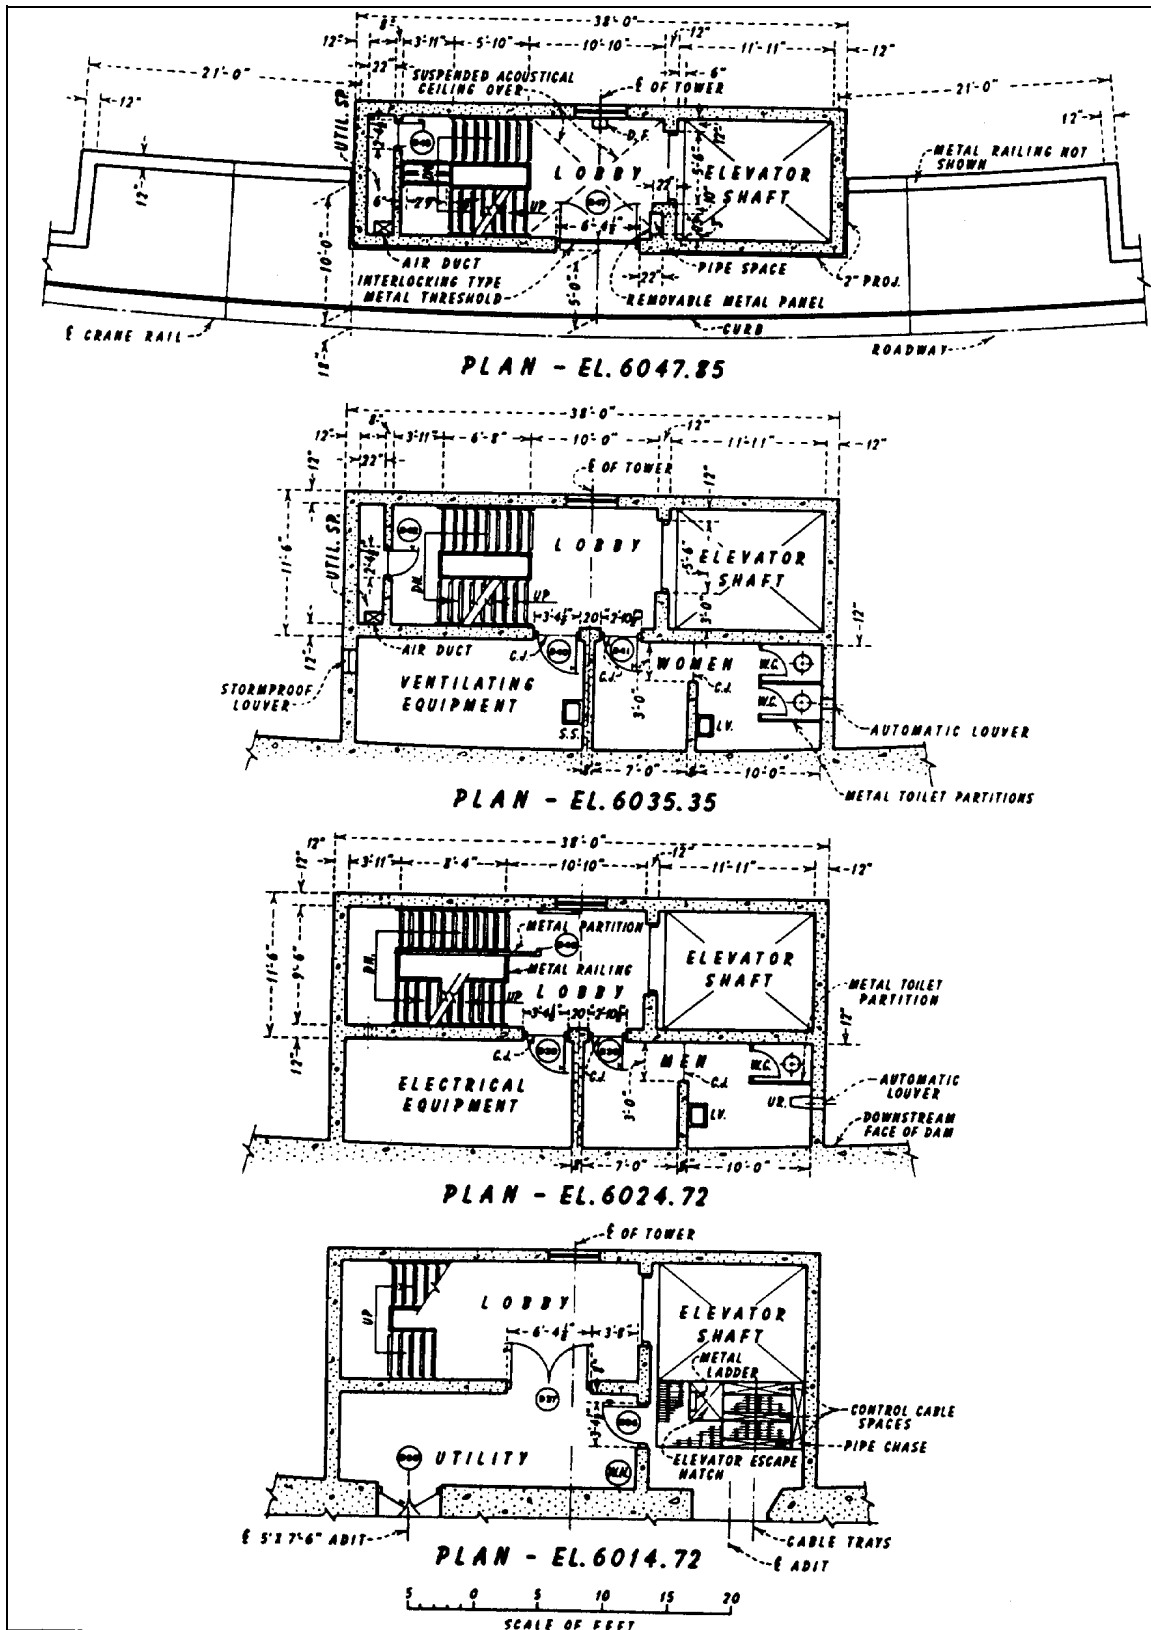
Details of layout of elevator shaft and tower in Flaming Gorge Dam (USBR)
